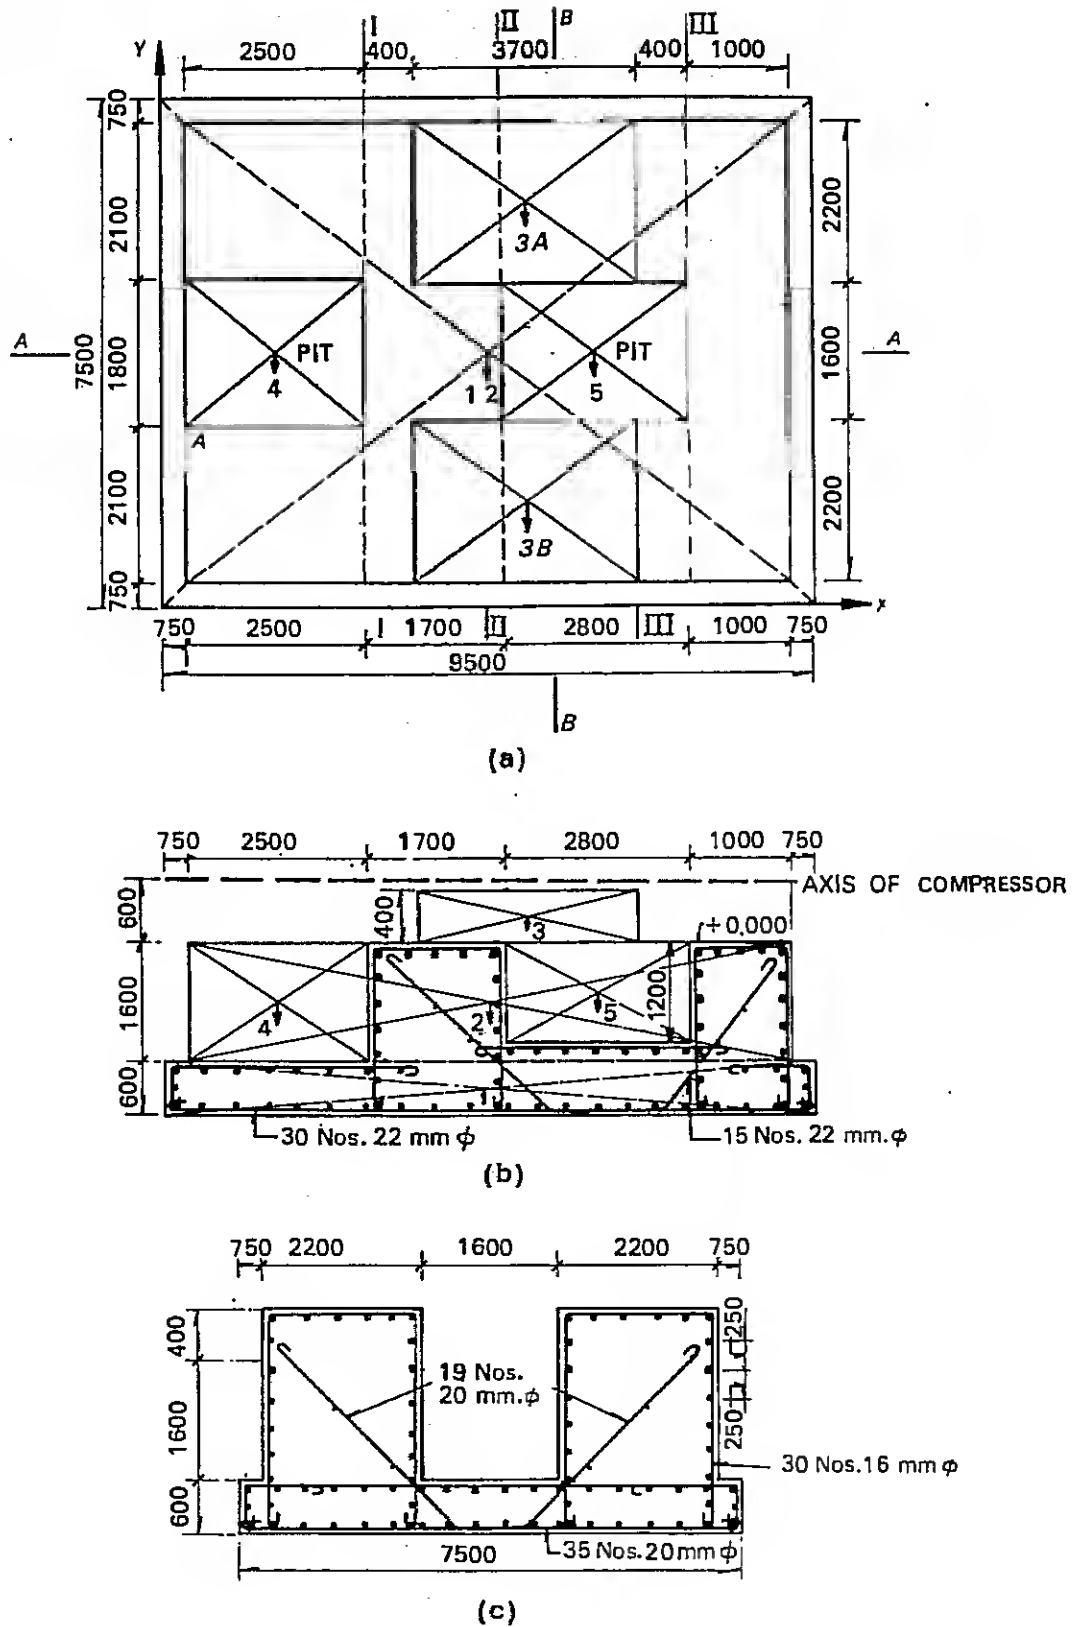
Foundation for a Horizontal Compressor—(a) Plan at Shaft Level, (b) Section A-A, (c) Section B-B.
